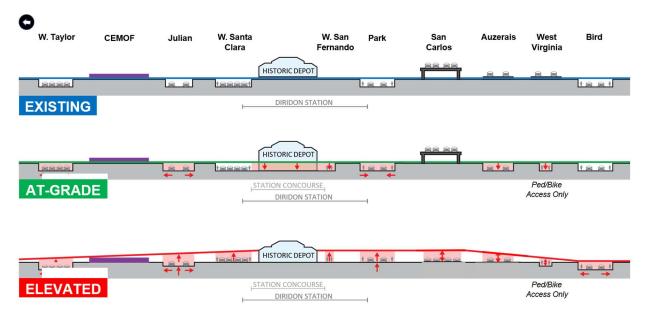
Vertical profiles of the At-Grade and Elevated station alternatives with proposed grade crossings.
